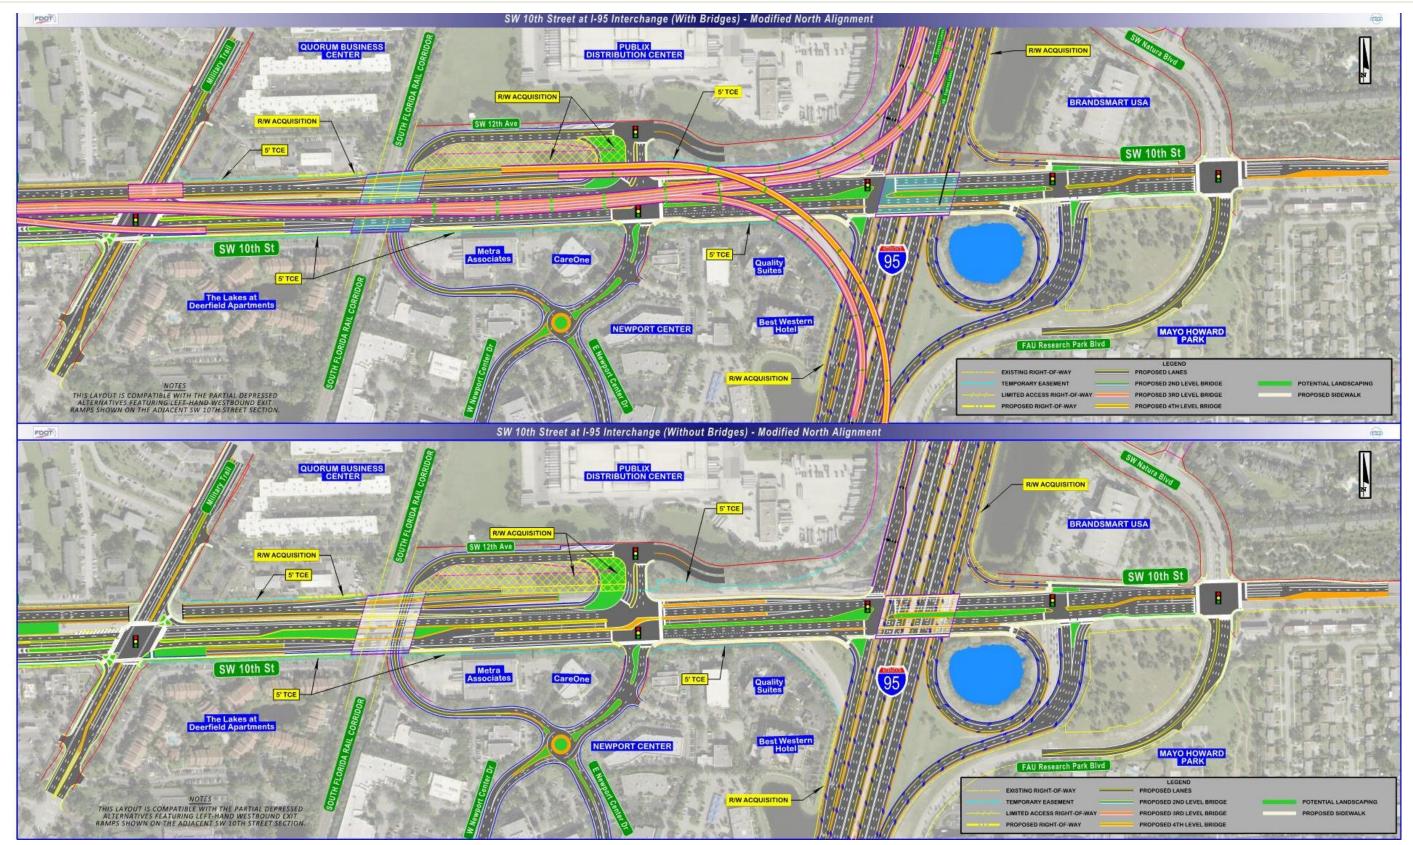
5: SW 10<sup>th</sup> Street - North Alignment Concept Plan
